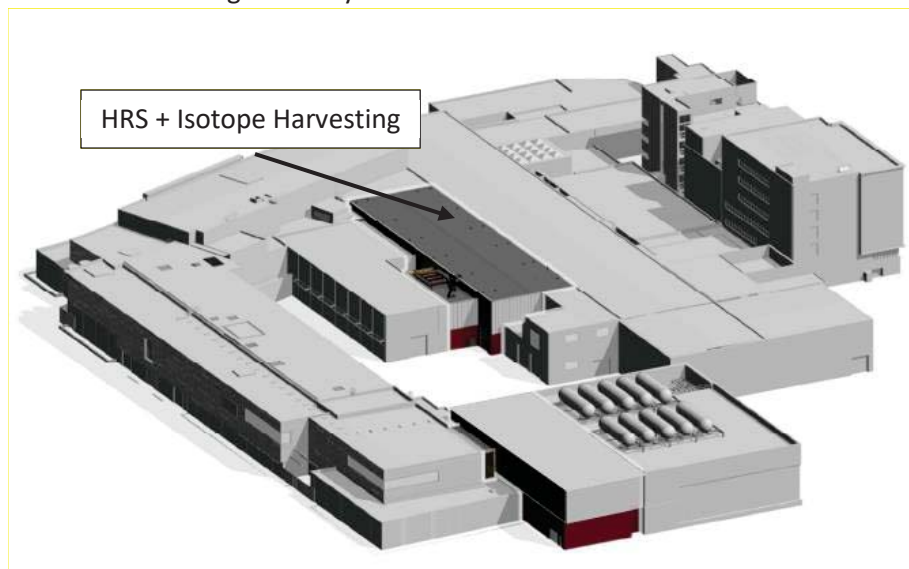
New high bay building constructed by MSU with non-federal funds that would house the HRS and Isotope Harvesting capabilities. The building was substantially completed in December 2019.
